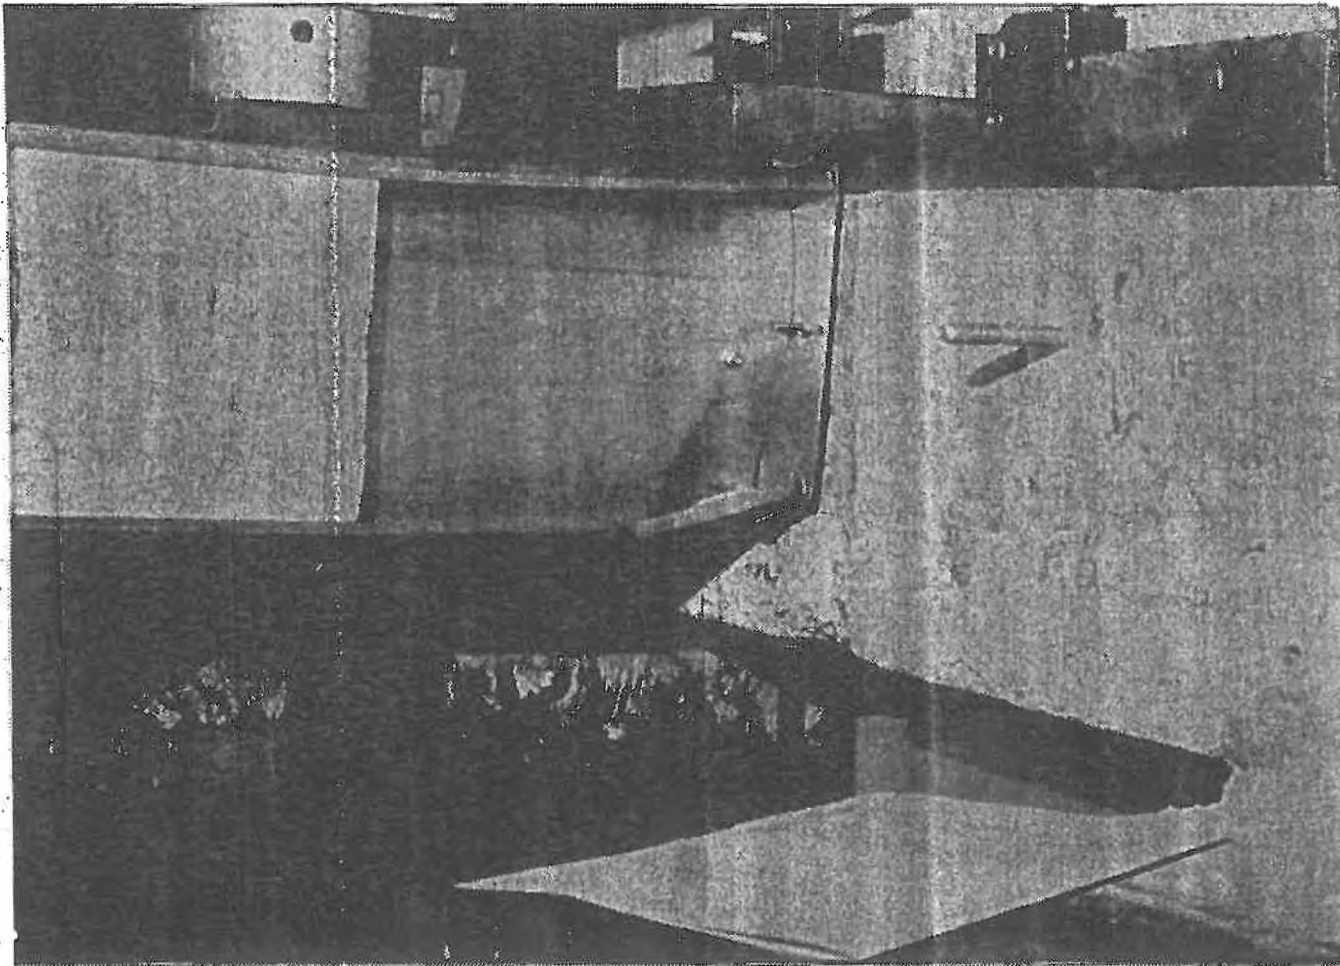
Photograph of Typical Failure for 20 Gauge, 150 mm Deep Specimen - D6
